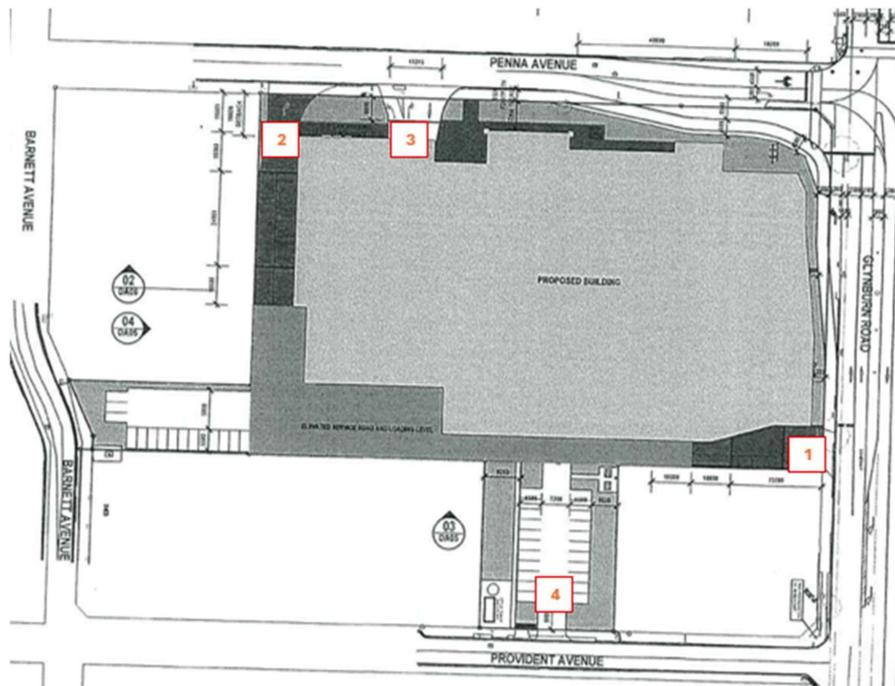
Approved plans for site showing access points (Source: Group 4 Architects; modified by BEES)
